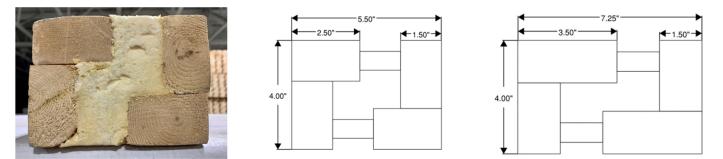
BARENAKED TSTUD™ STRUCTURAL HEADER
